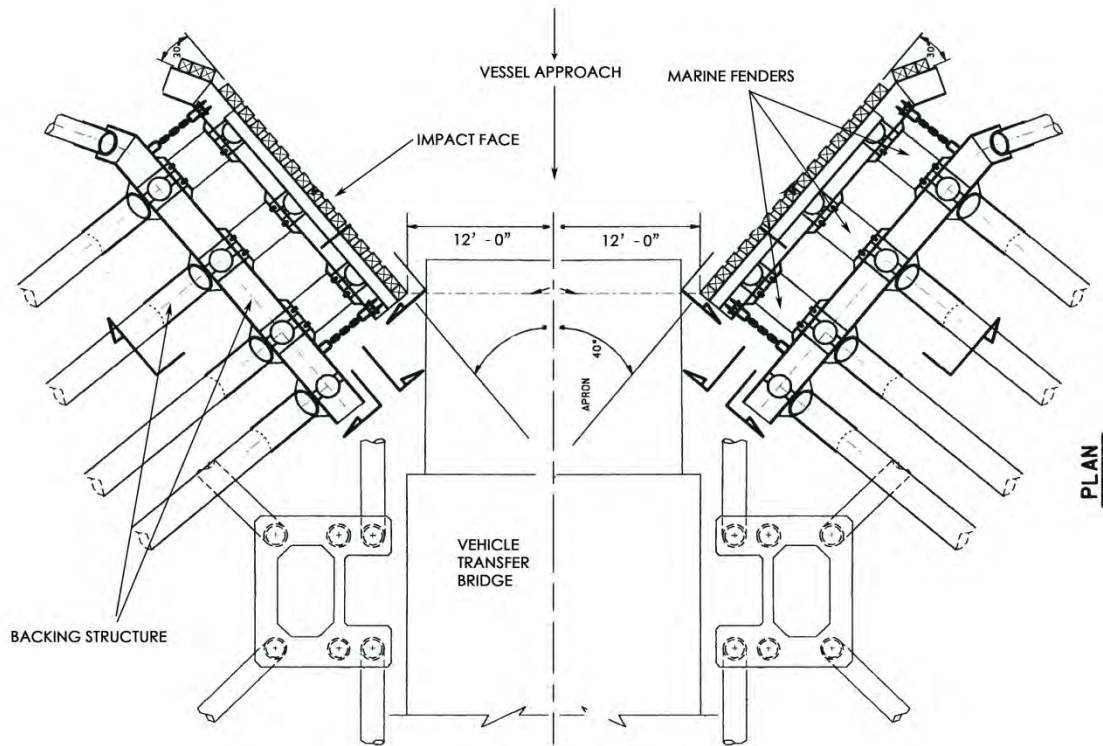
Bremerton slip as-built drawing plan view, courtesy WSF
